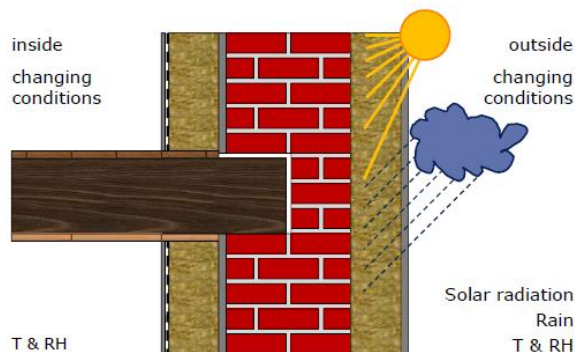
Masonry with wooden floor beam. Possible ways of insulating masonry and parameters influence the retrofit solution.
